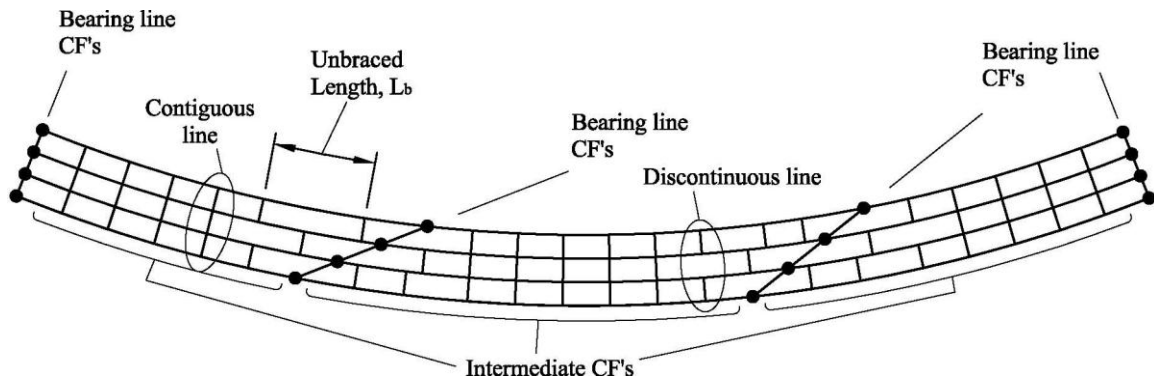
Typical distribution of cross-frames in a bridge layout
